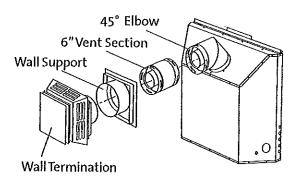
Typical minimum horizontal vent configuration - 5/8 Simpson DuraVent. Do not use 4/6 pipe in this configuration.
